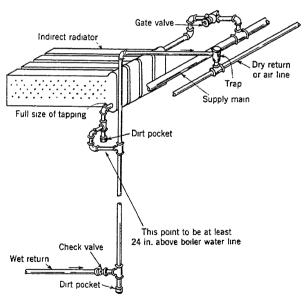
Typical Piping Connections to Concealed Heating Units with Wet Returns
